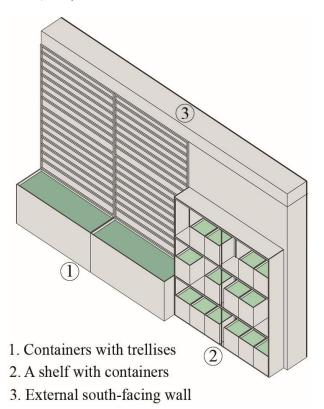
Modular wall planters attached to a south-facing exterior wall (developed by the author, 2023).
